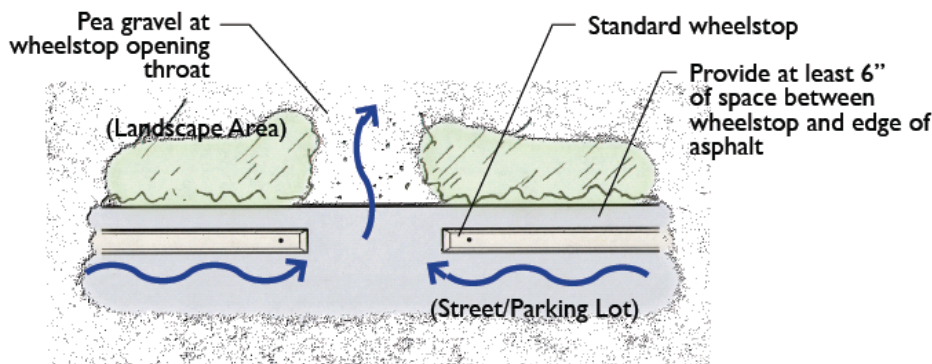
Opening between wheelstop curbs: plan view (Source: SMCWPPP 2009)
